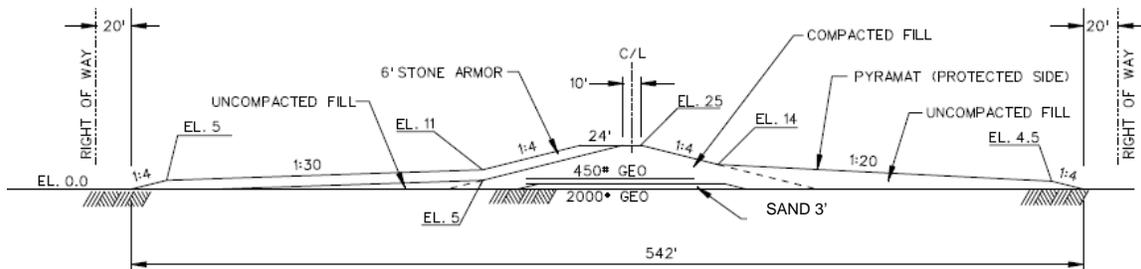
Typical Geotextile-Reinforced Embankment Section (Clay Fill)
